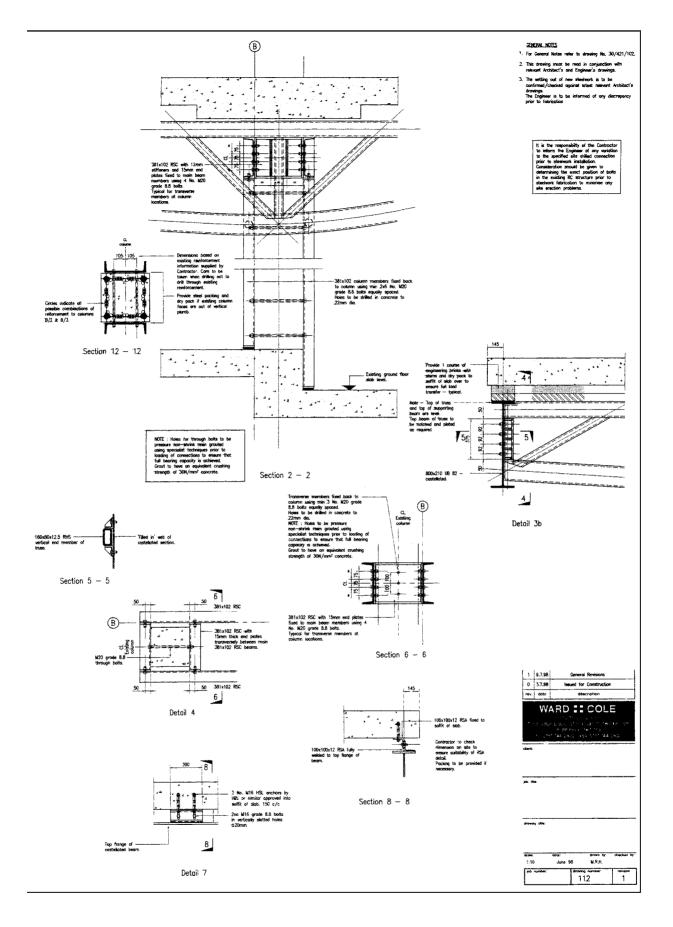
A truss with a castellated beam and fastenings—construction drawing
